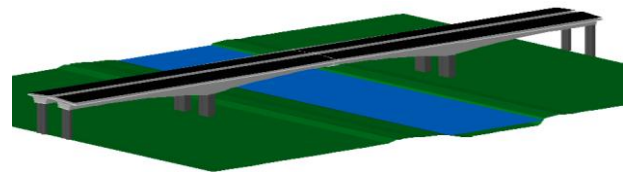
3D model of the cantilever constructed box-girder bridge.
